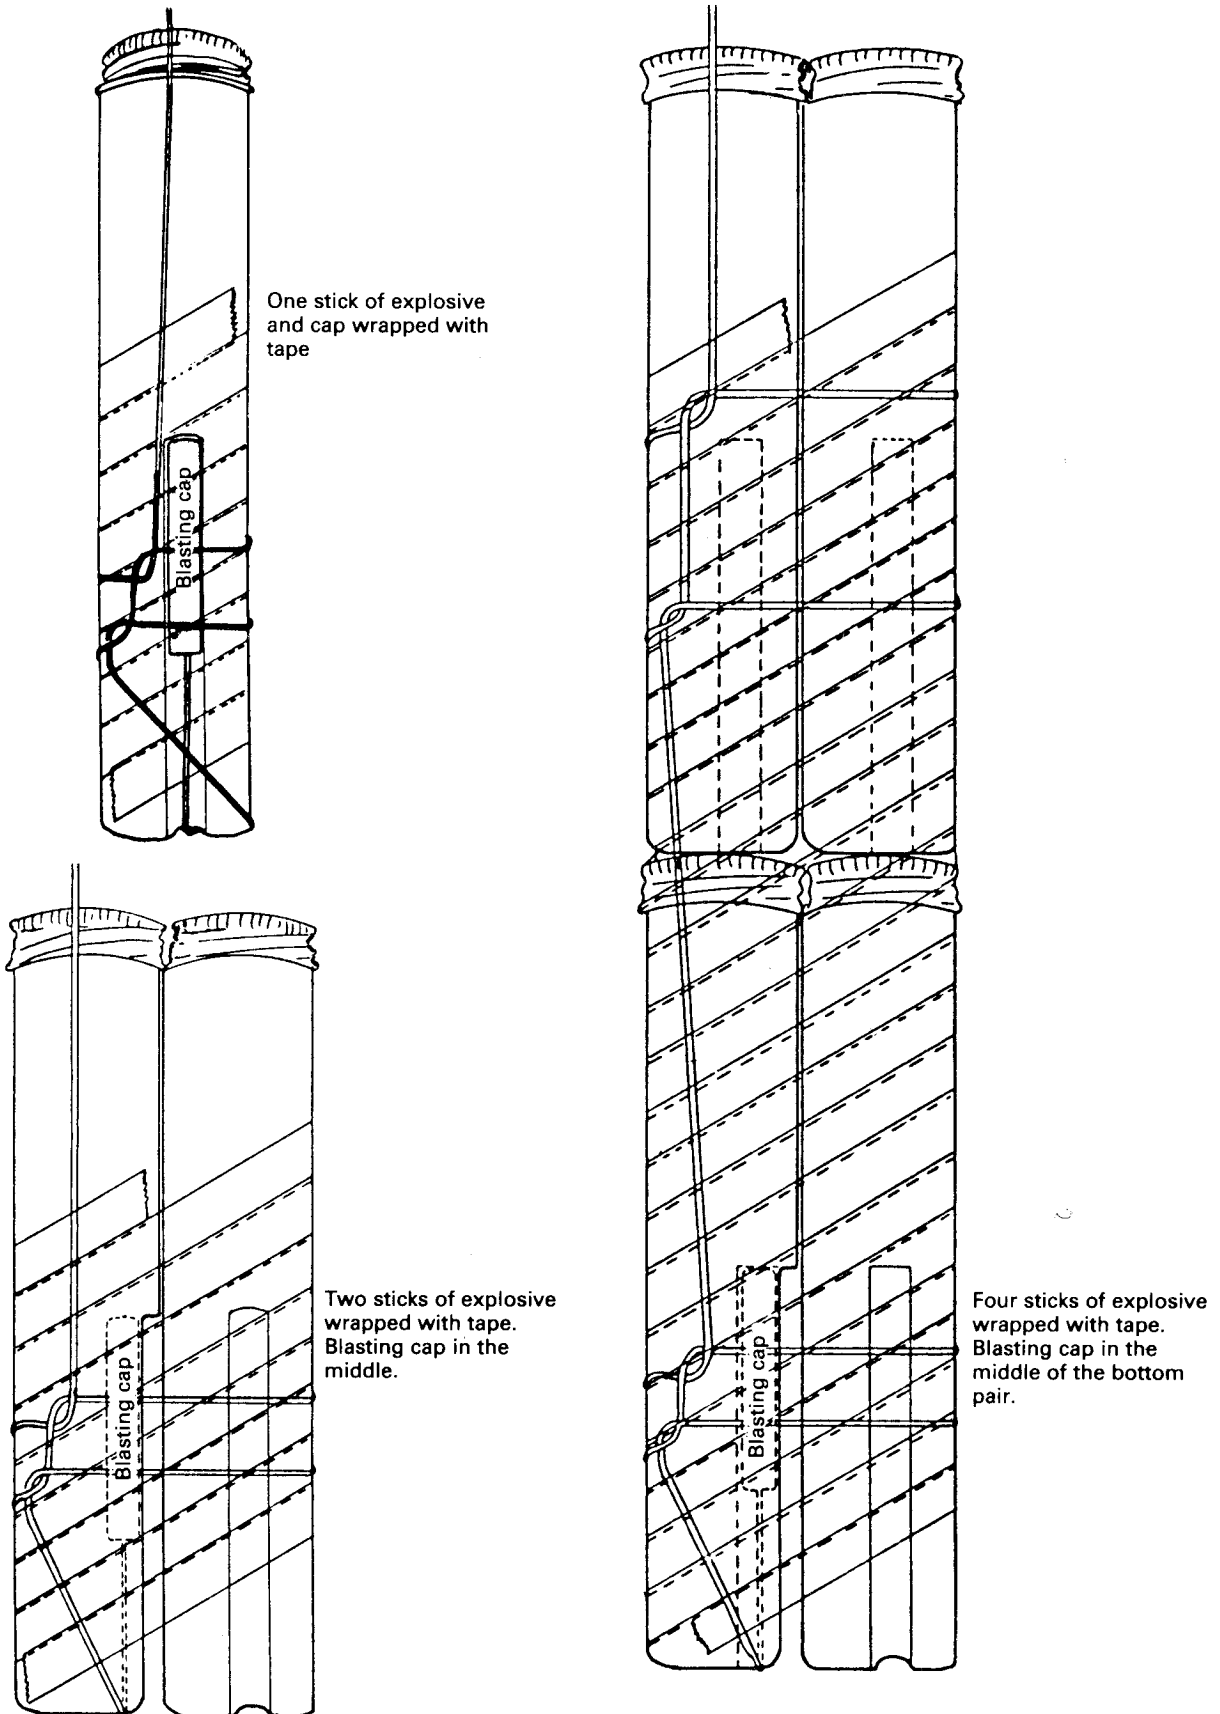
Assembly of explosive cartridges and electric blasting caps.
